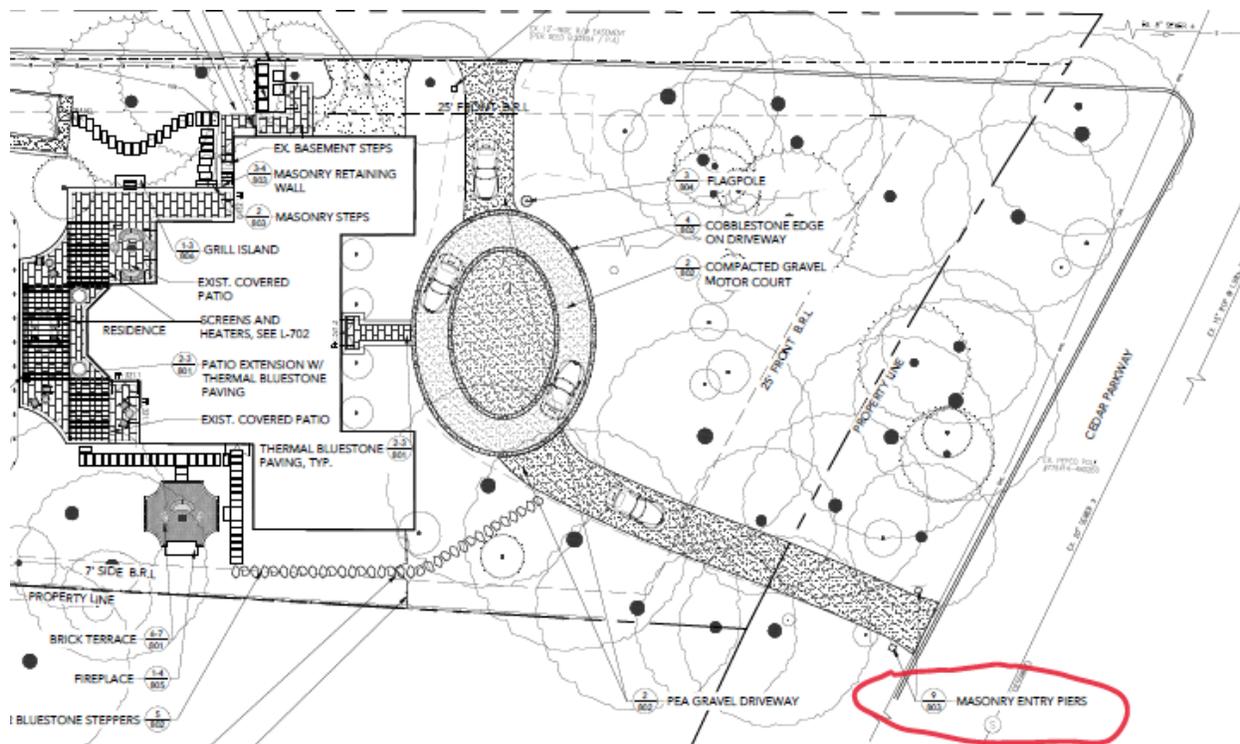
Proposed site plan showing the piers outside the property boundaries and within the ROW.
